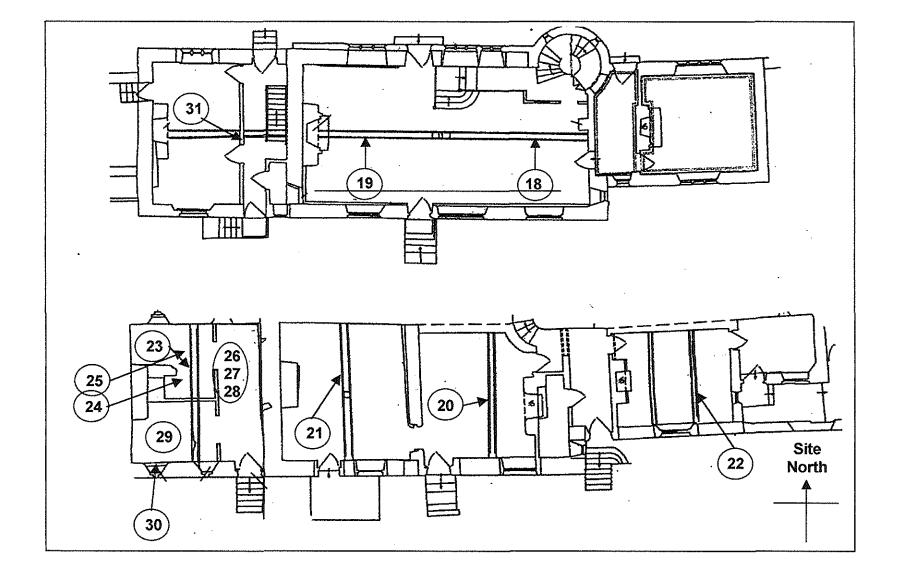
Plan of the basement (bottom) and ground floor (above) showing timbers sampled (after Field Archaeology Specialists Ltd, York)
